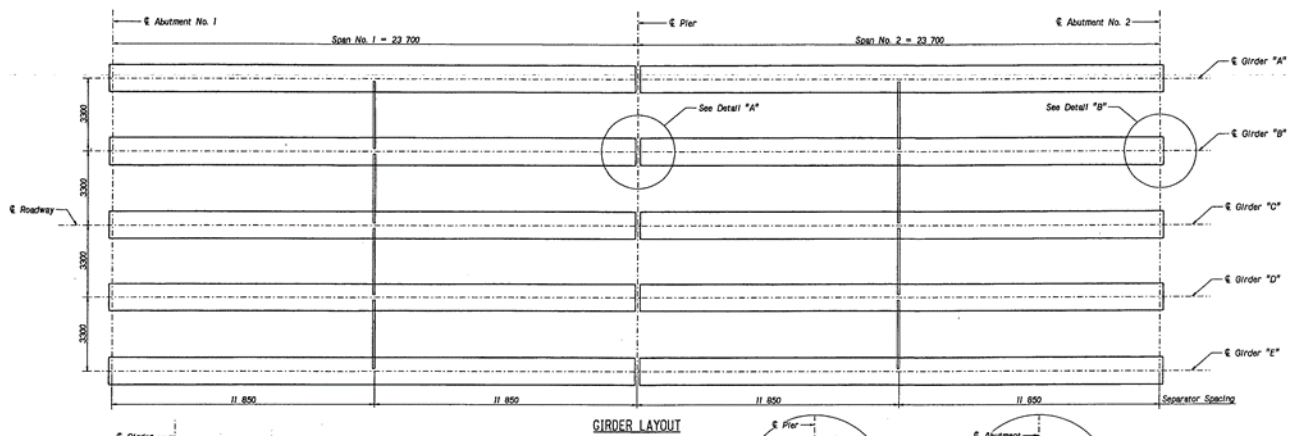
Plan view from the construction documents of Schuyler Bridge system, courtesy of NDOT
